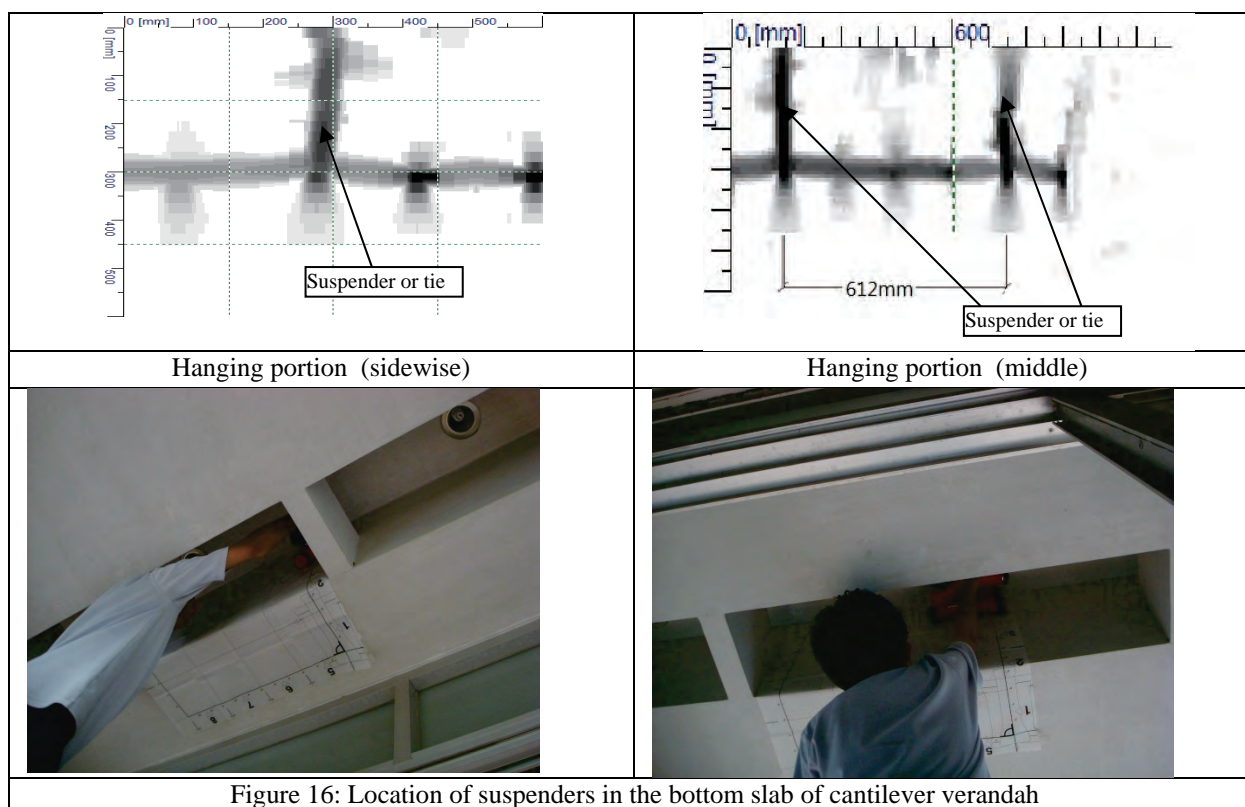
Location of suspenders in the bottom slab of cantilever verandah
